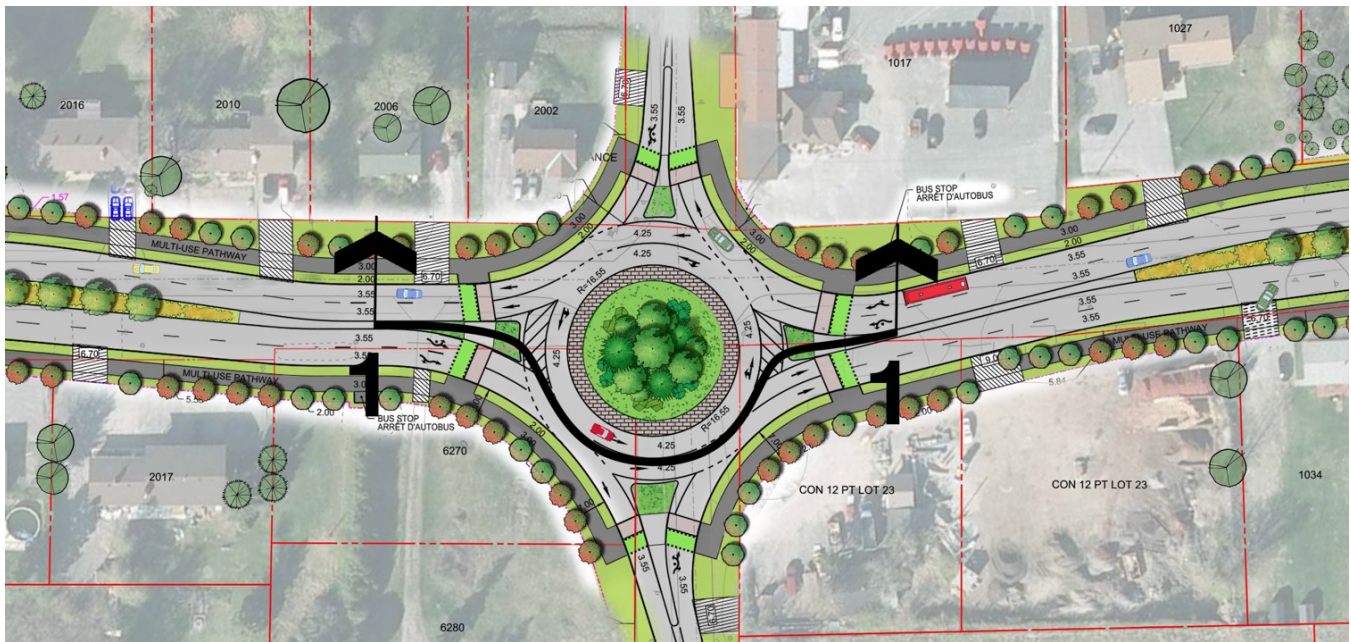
Alternative B - Roundabout at Kittiwake Drive/Echowoods Avenue
